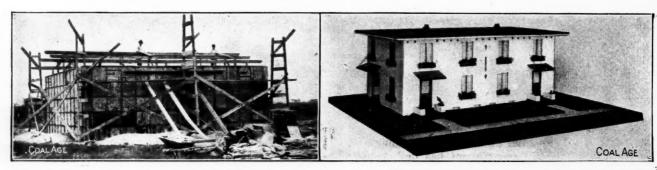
Plan Adopted Where Rapid Construction Is Fig. 6. House Model Showing Cheerful Yet Simple Desired Effect
